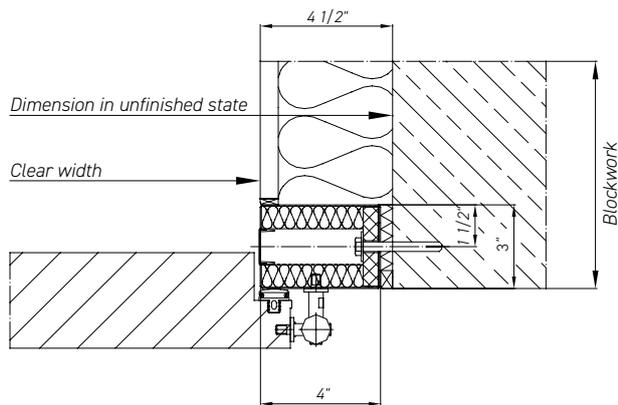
Block / Block frame with pocket holes in the reveal area
